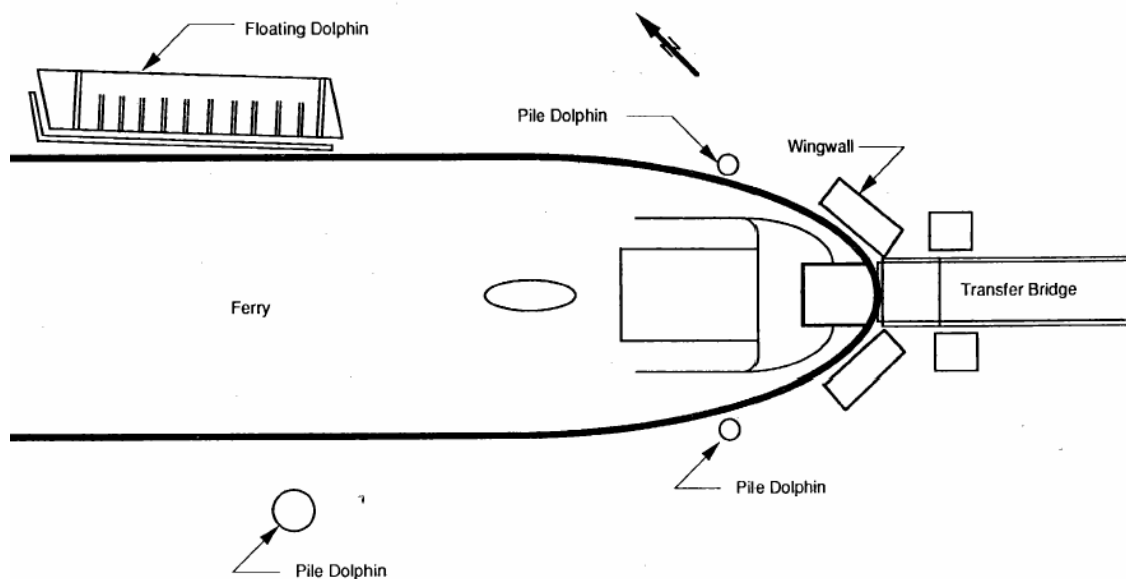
Plan View of a Typical WSF Fender System (Jahren, 1993).
